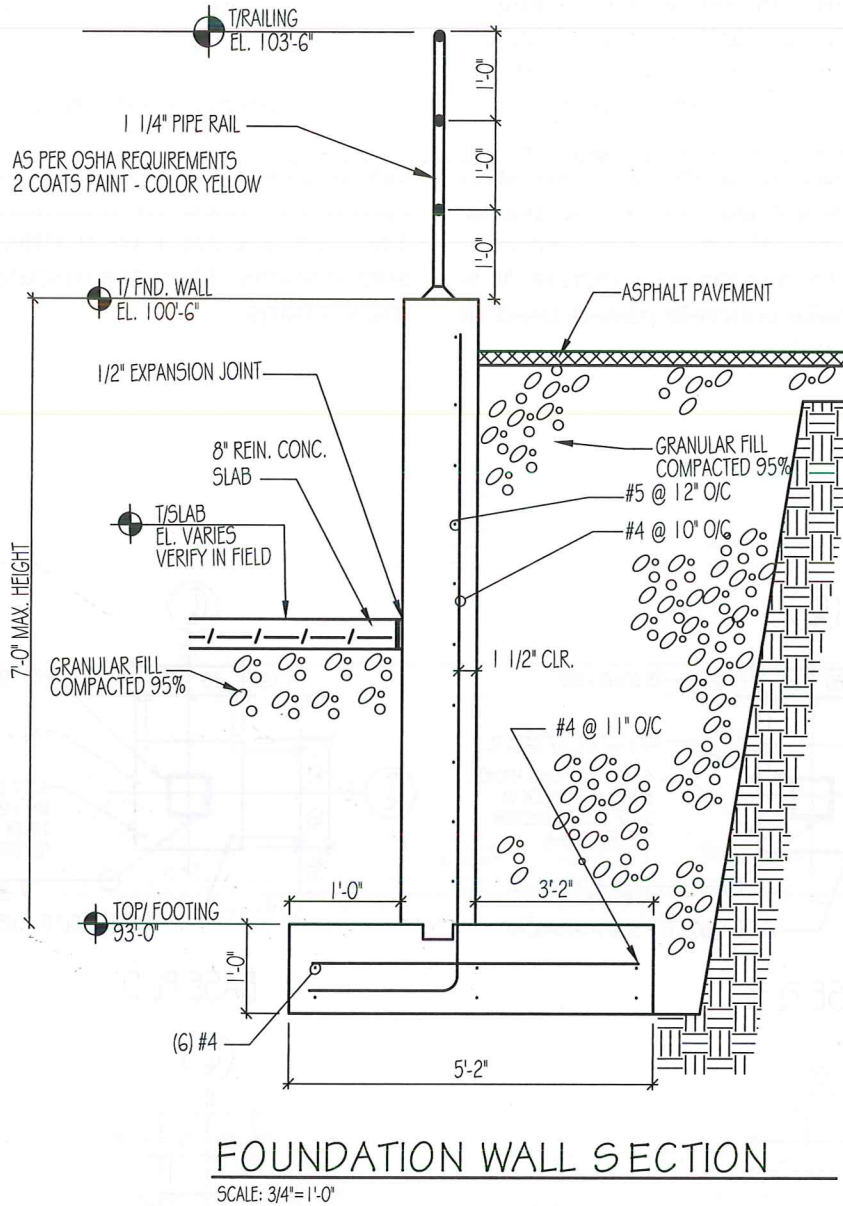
This foundation section shows the use of reinforcing bars and wire mesh to strengthen the footing and foundation wall. (Charles E. Smith, Areté 3 Ltd.)
